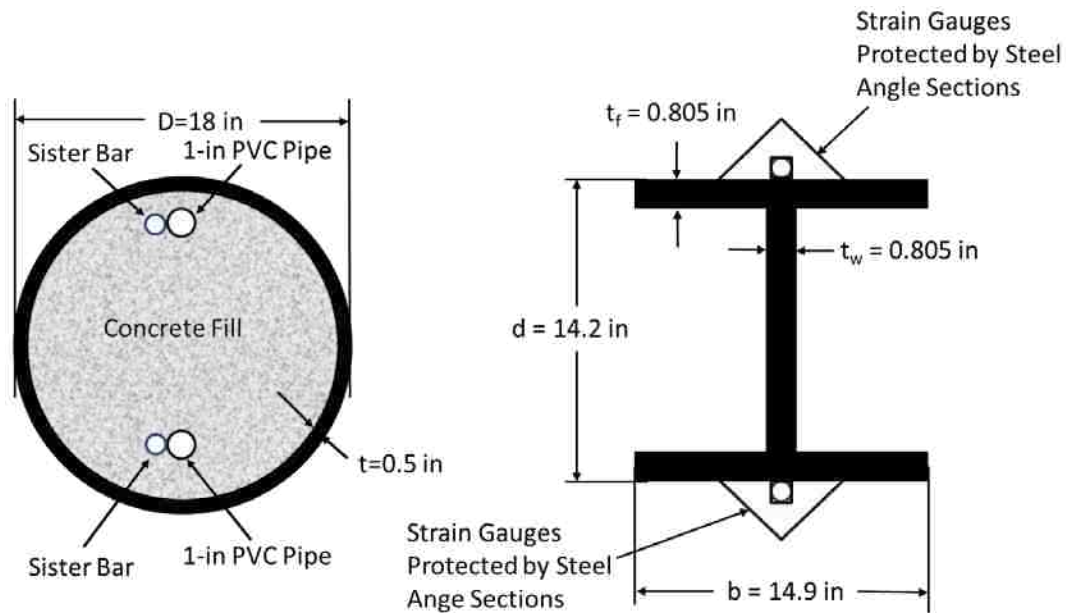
Cross sections for the 18-inch diameter pipe pile and the HP14x117 H-pile.
